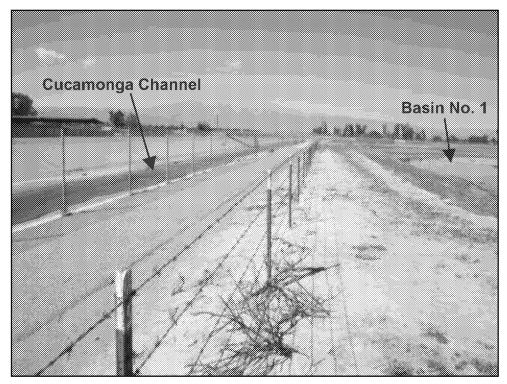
View facing west of the southwest corner of basin No. 1. Note a concrete spillway was present in the southwest corner of the basin, adjacent to Cucamonga Channel.
